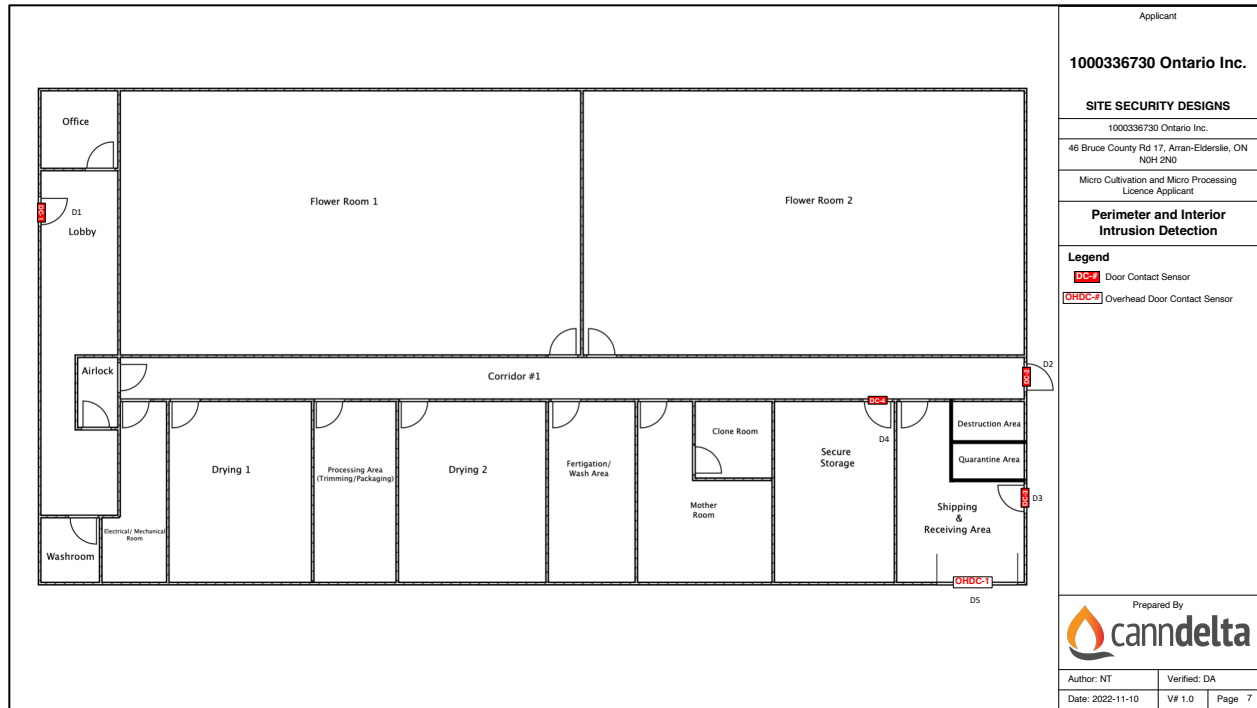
1000336730 Ontario Inc. 's site floor plan with alarm partitions.
